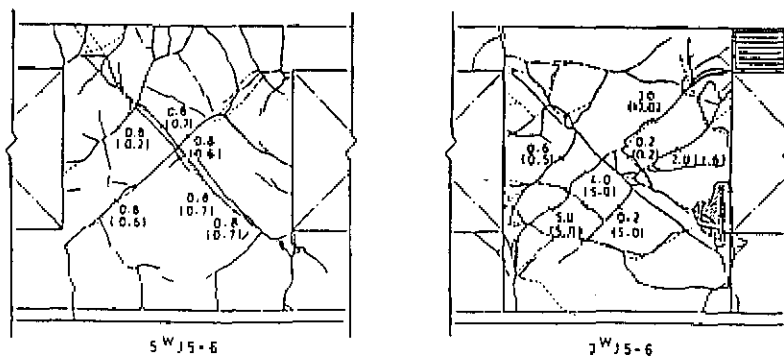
CRACK PATTERN OF EXTERIOR J-FRAME IN X-DIRECTION
